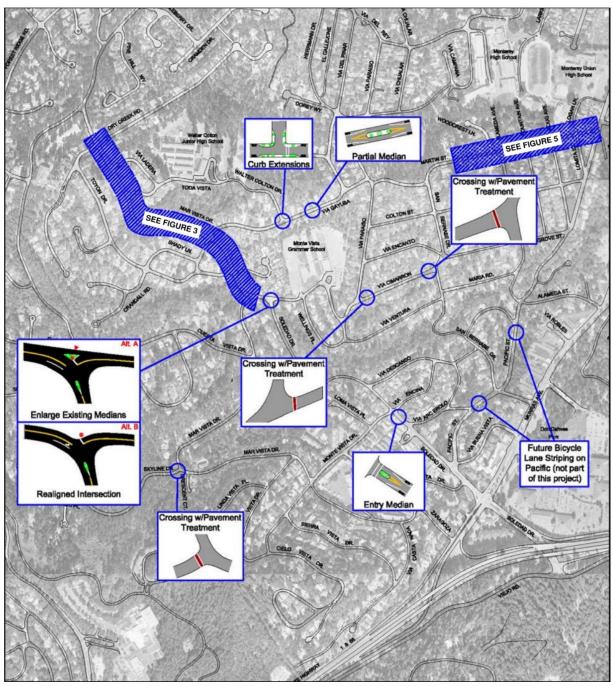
Traffic Calming Plan for Monterey Vista Neighborhood
